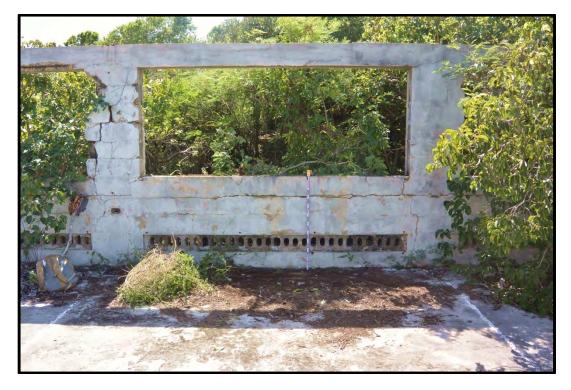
Photograph of south wall details, note the large window openings and ventilation features near the base of the wall
